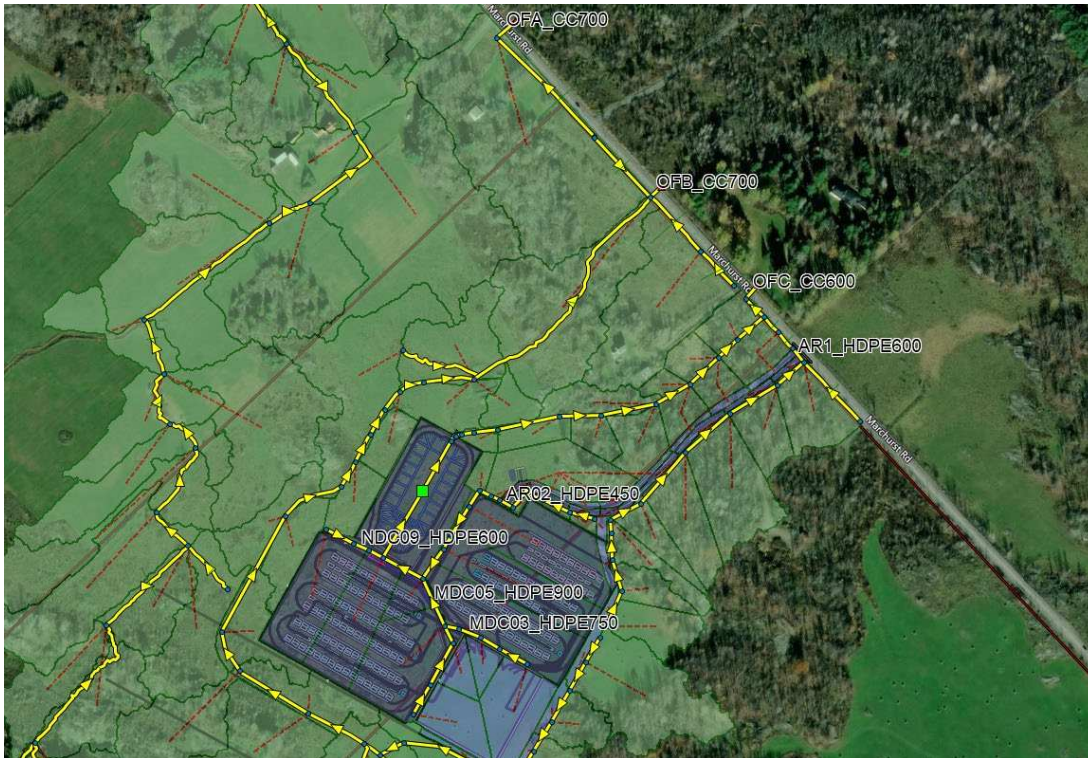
Layout with conduit ID of culverts (proposed and existing culverts)
